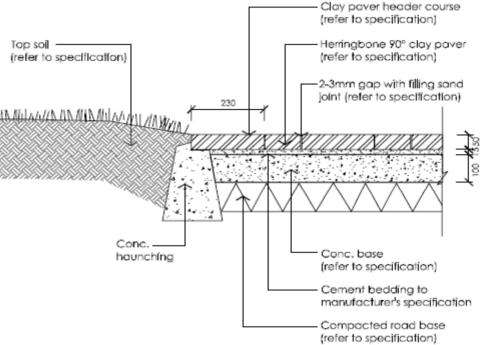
Installation of Clay Pavers & Set Out Pattern.
